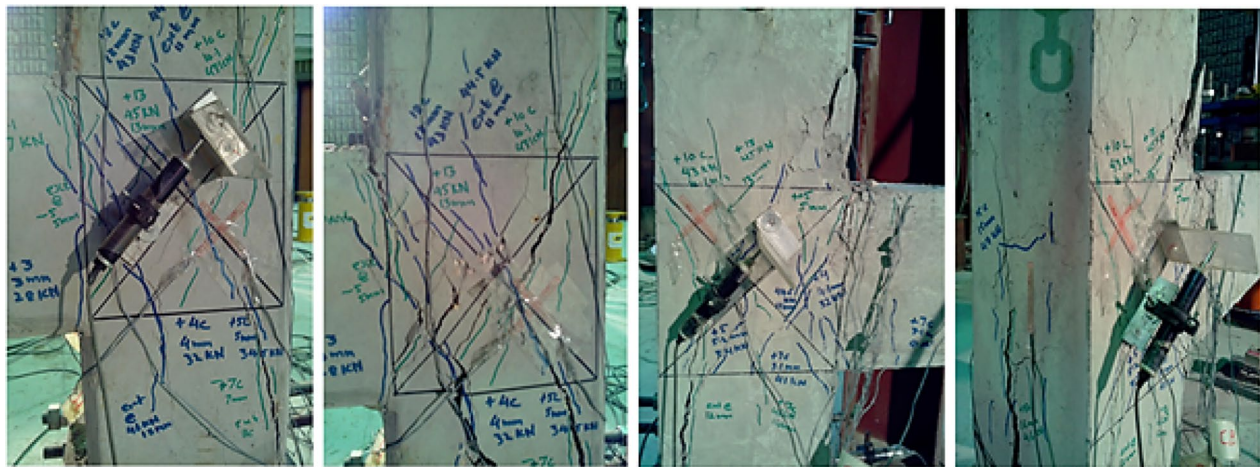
Crack pattern at intermediate and final loading stage of specimen SP-5.
